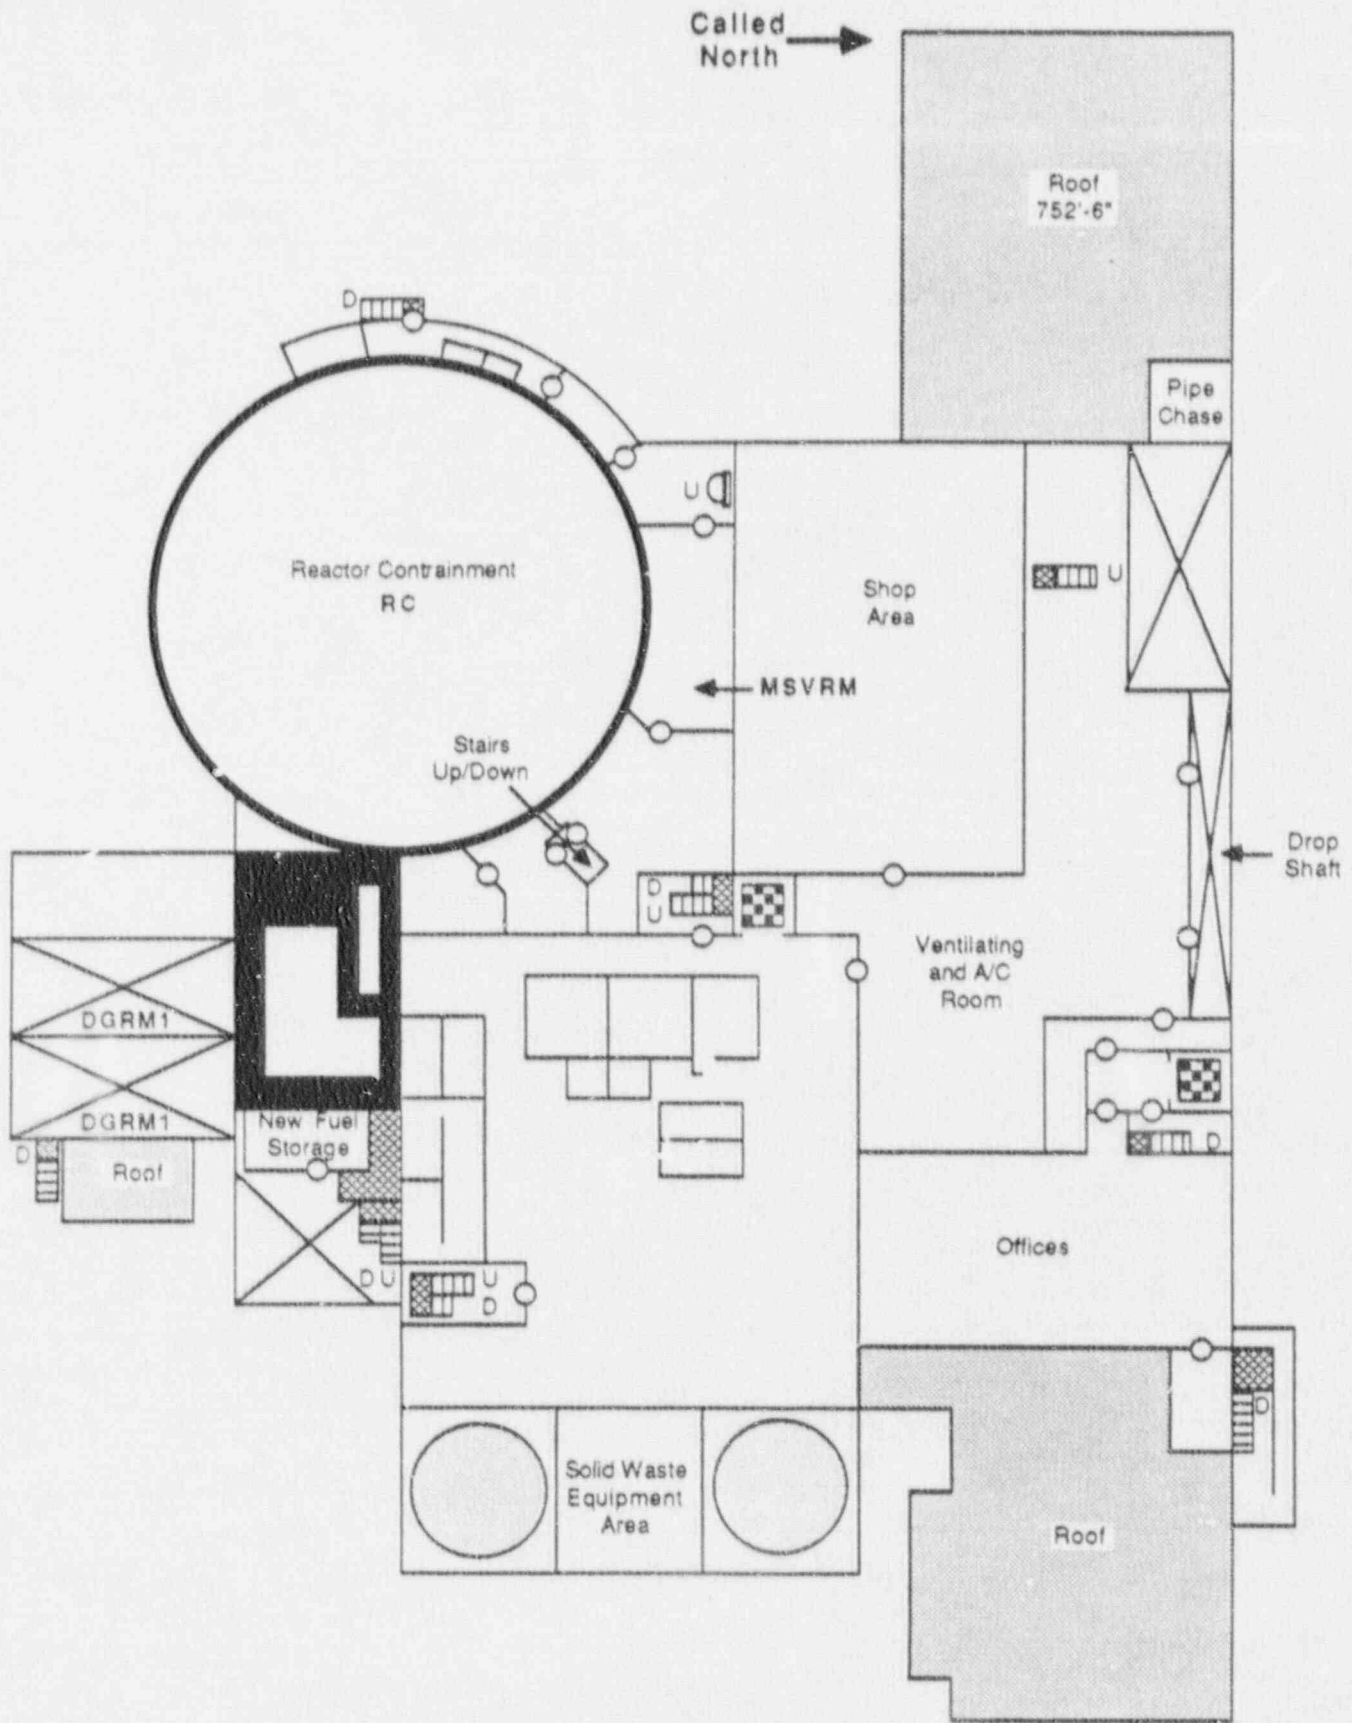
Beaver Valley Unit 1 Station Arrangement, Elevation 752'-6"
